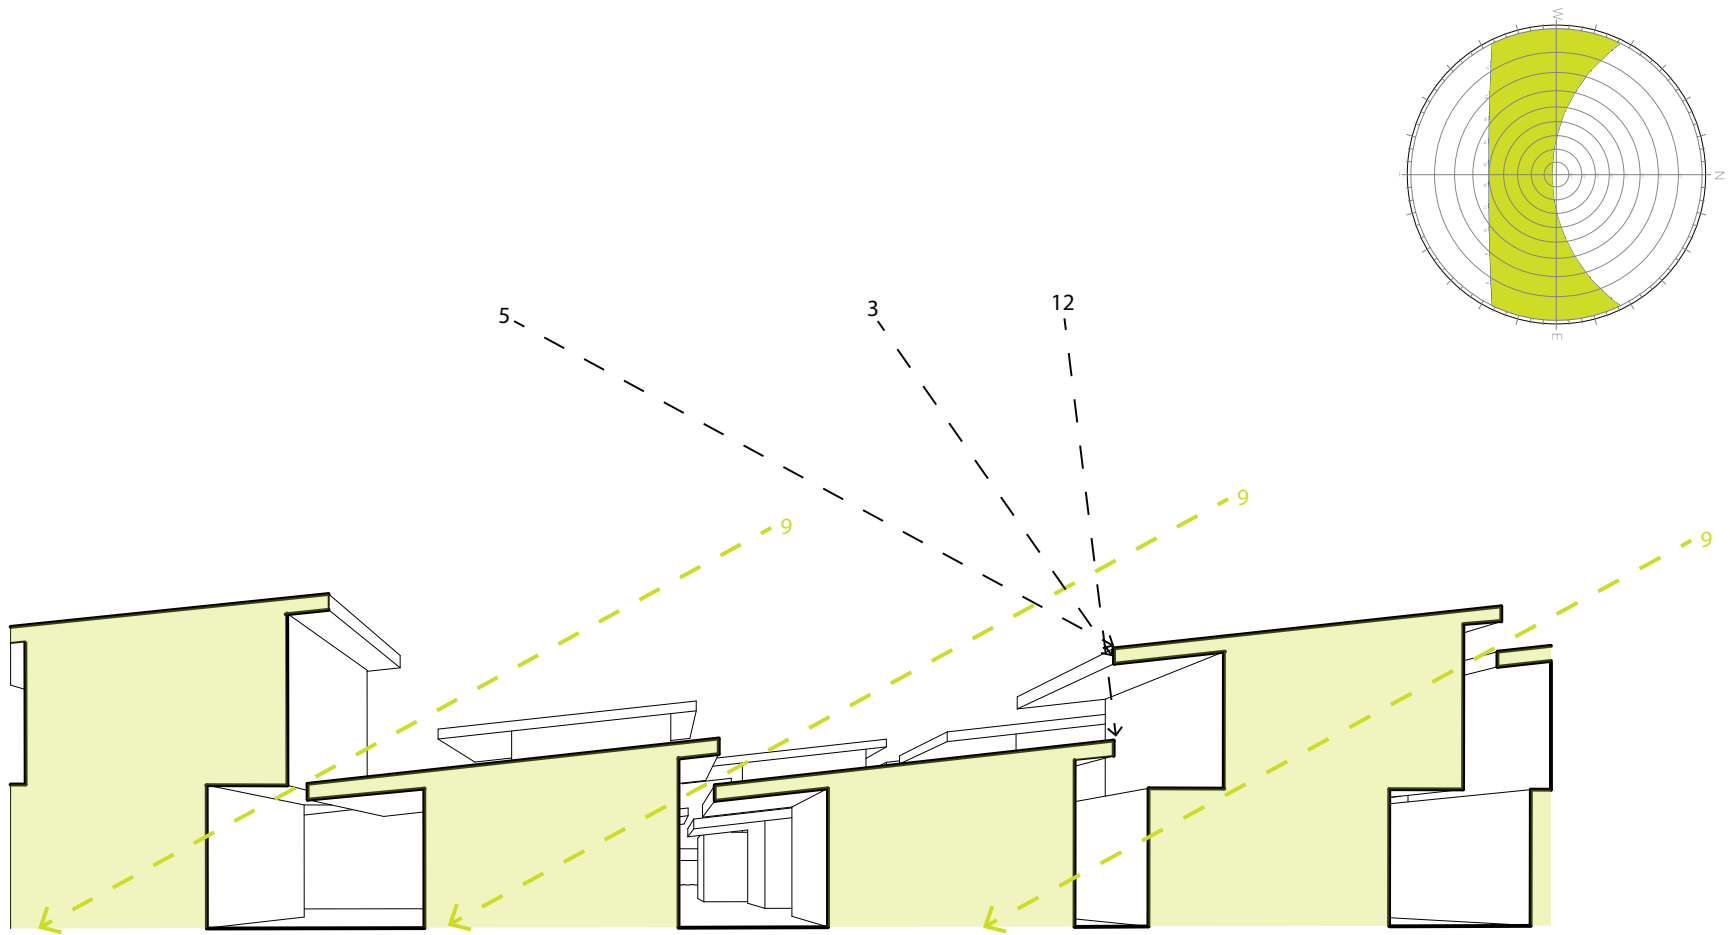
SECTIONAL DIAGRAM SHOWING ROOF OVERHANGS SHADING OUTDOOR PORCHES
